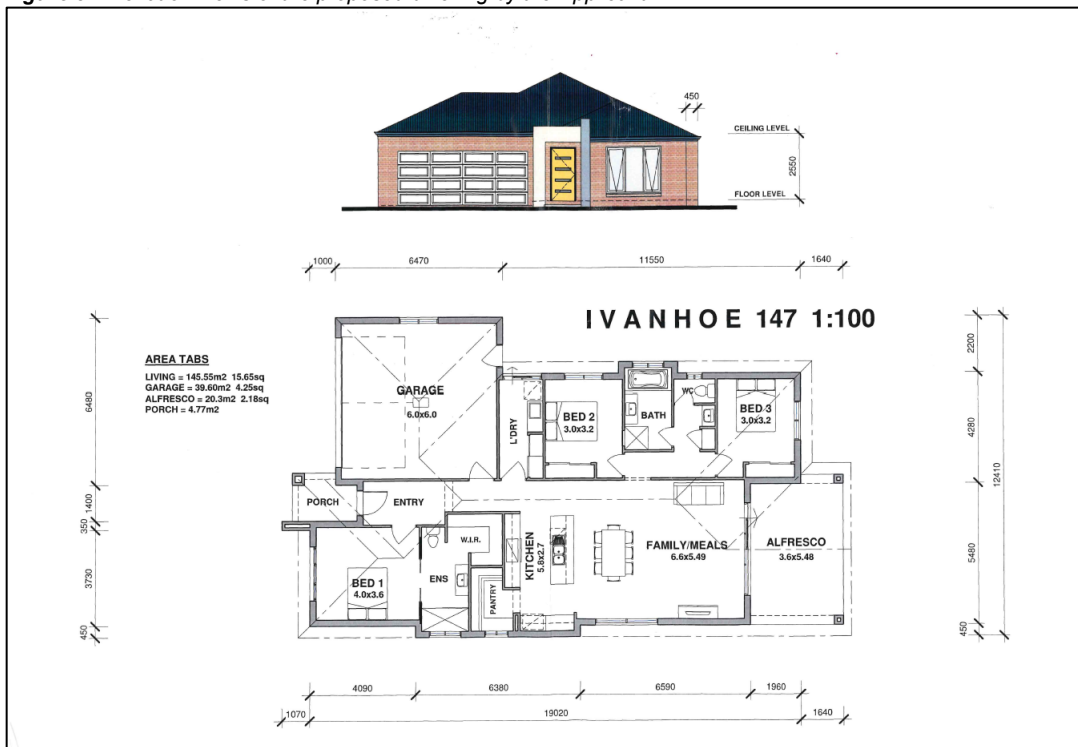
Floor plan of the proposed dwelling by the Applicant.
